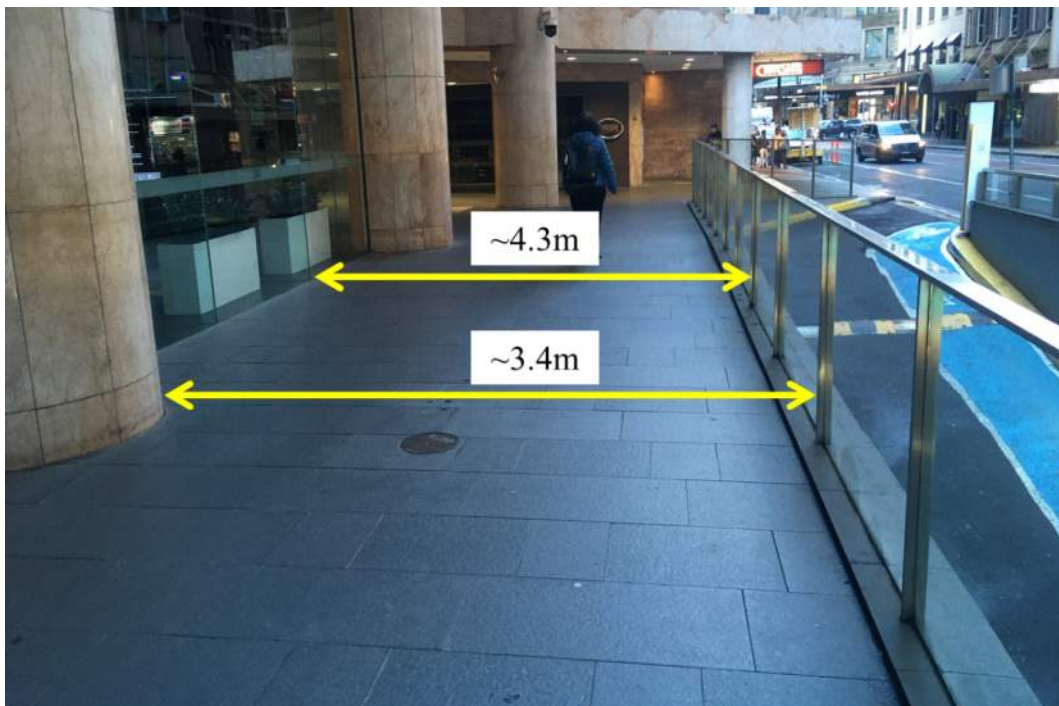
Castlereagh Street west, looking south, just south of the proposed development
